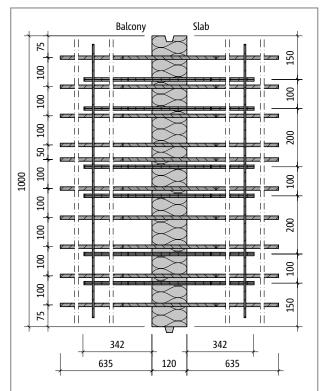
Schöck Isokorb® XT type D-MM4-VV1: Plan view
